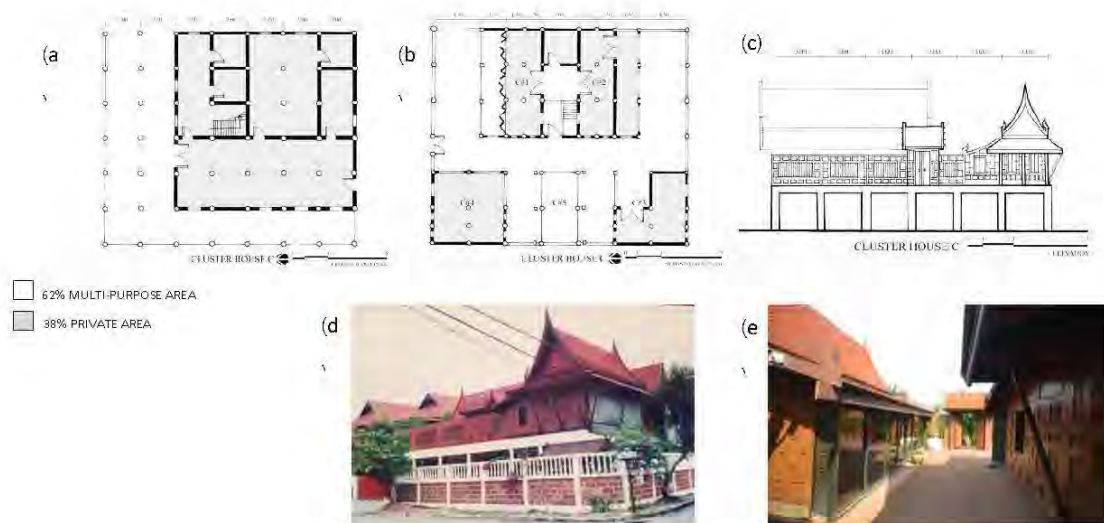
House Cluster C (a) Ground Floor Plan (b) Second floor plan (c) Elevation (d) House C#4 (e) House C#4(left) and C#1(Right)
